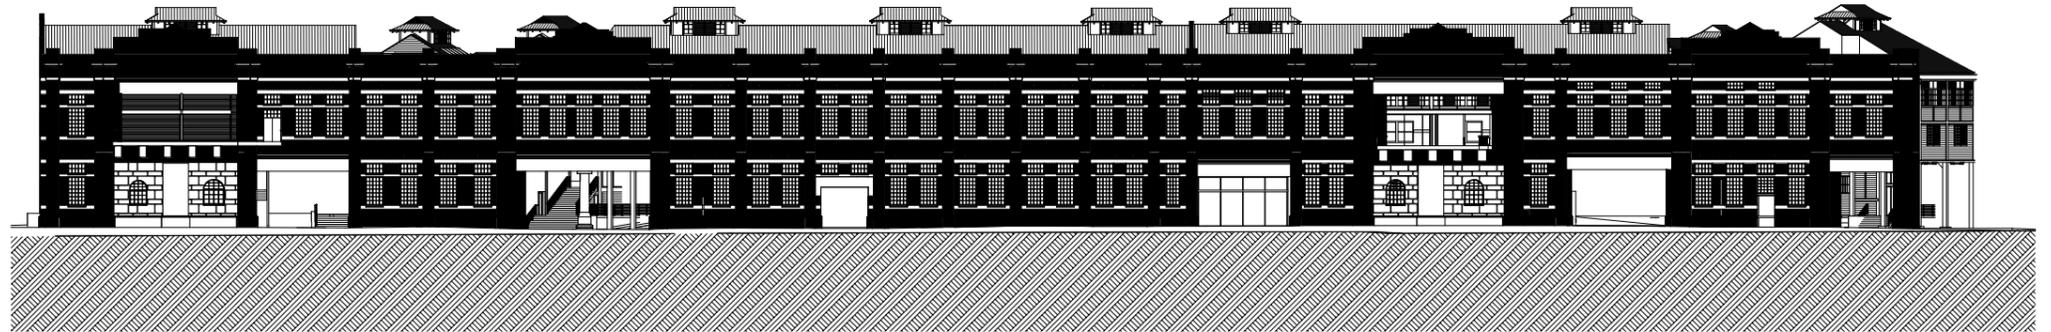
Existing Hickson Road south elevation Shore Sheds.
